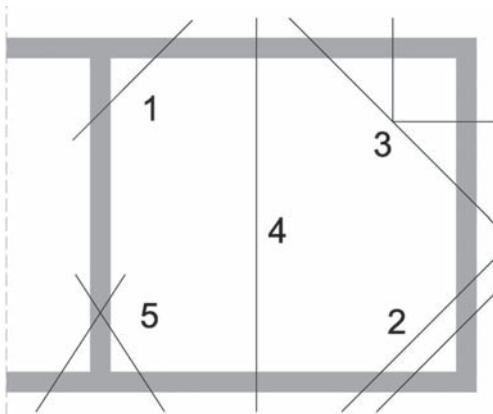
Schemes of reeled braces. 1 Diagonal single. 2 Diagonal double parallel. 3 Diagonal reinforced double. 4 Perpendicular single. 5 Diagonal (Façade and load bearing wall) single.
